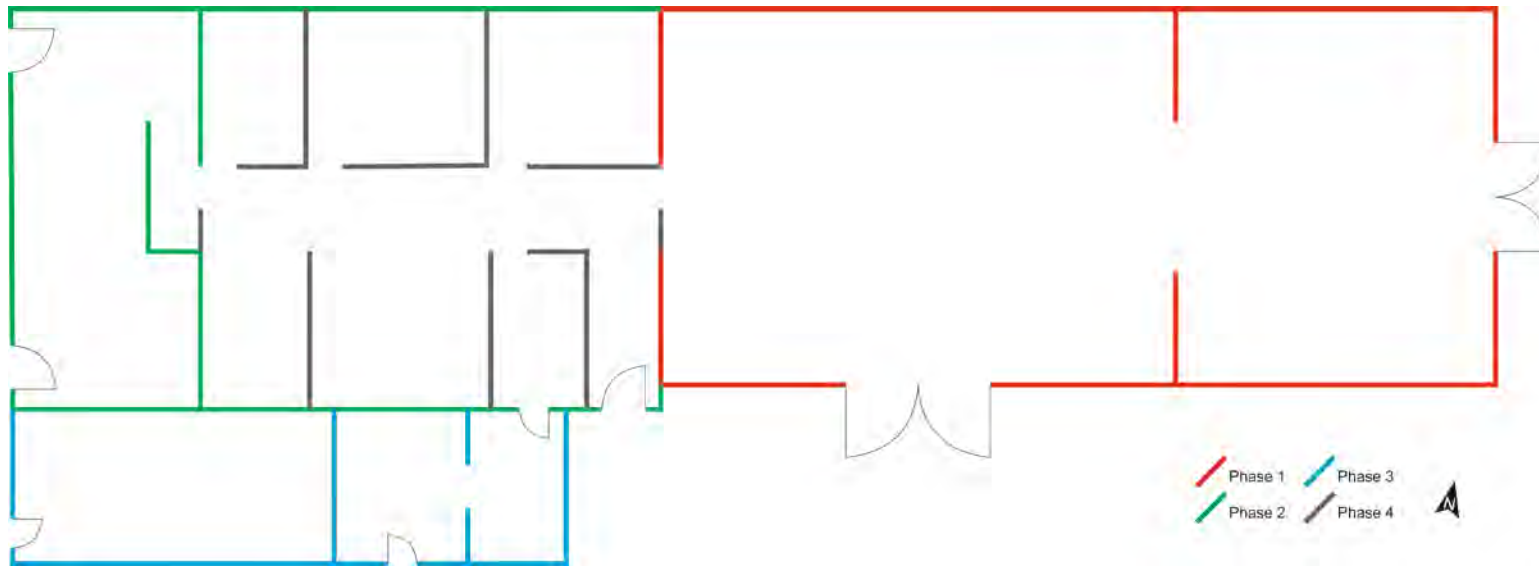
Building 1 Phase plan, c. 1:200 @ A4
